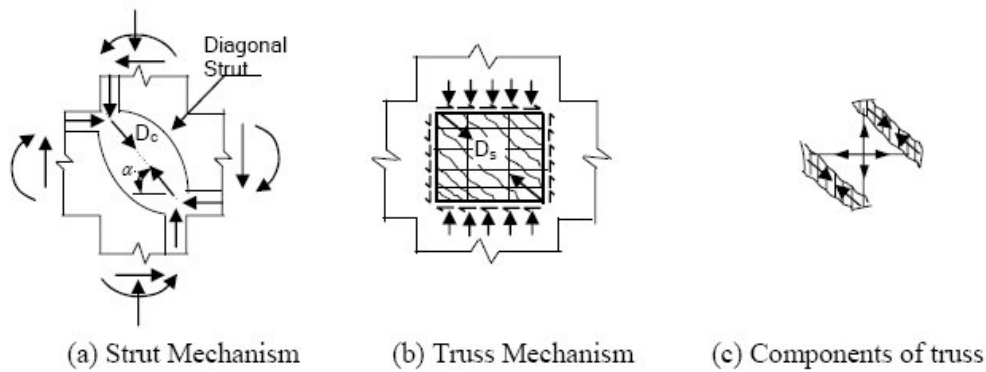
Shear resisting mechanisms: (a) concrete strut mechanism; (b) truss mechanism; (c) truss components
